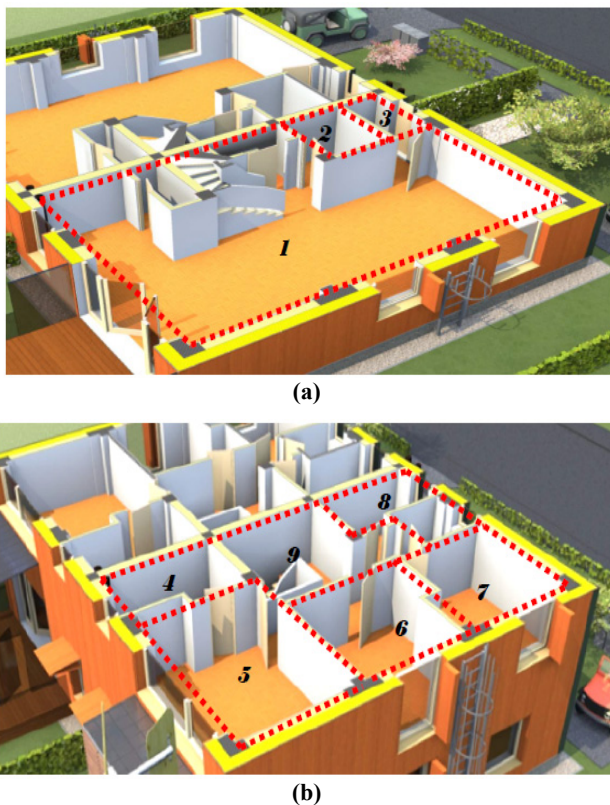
Thermal zones of the house (ground floor/first floor)
